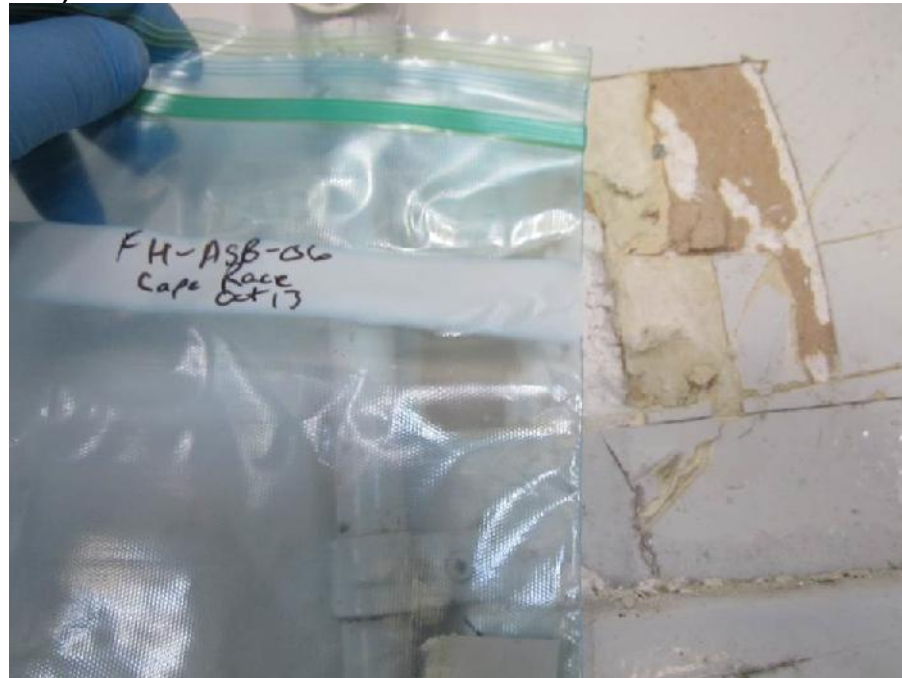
View of location of drywall joint compound and tape sample FH-ASB-06 (interior wall).
